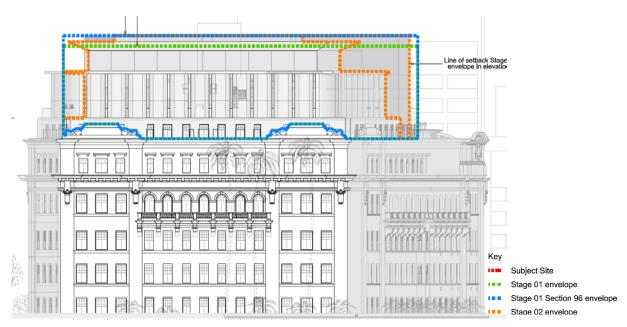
Education Building Elevation Concept Envelope Assessment *Source: MAKE
